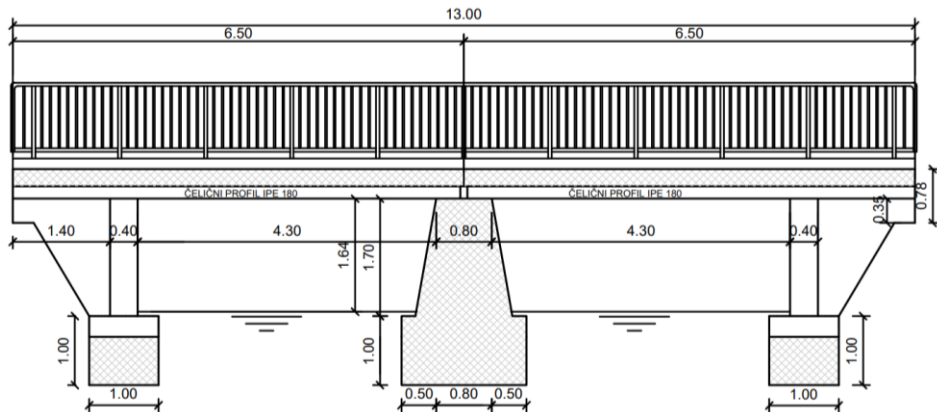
Longitudinal section of the repaired bridge - the first alternative solution
